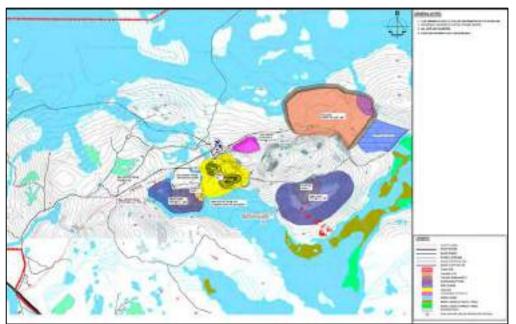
Mine Waste Management Layout of Pahtavaara
